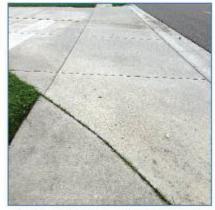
First Baptist Church of Progress Village Driveway Looking East
